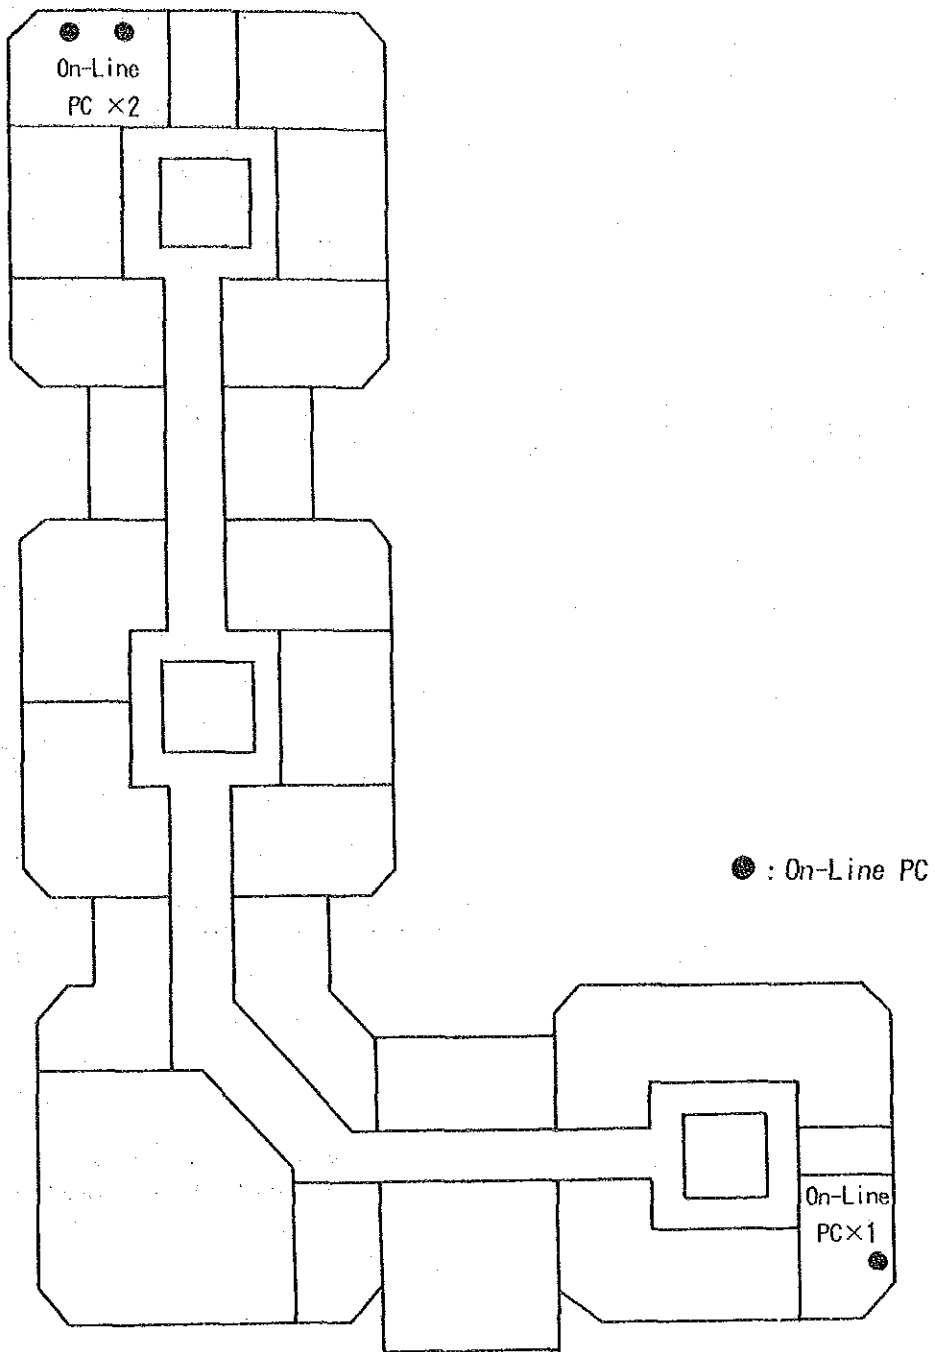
Floor Layout Plan of On-line Personal Computers (3/3)
